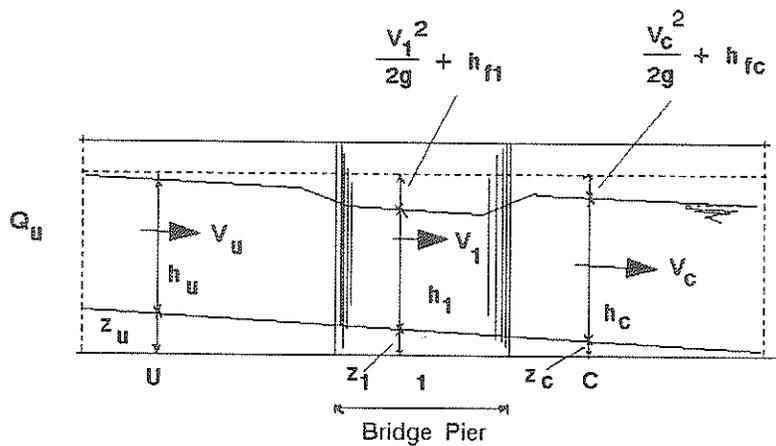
Opak Drain at Pluit Selatan Bridge Location
